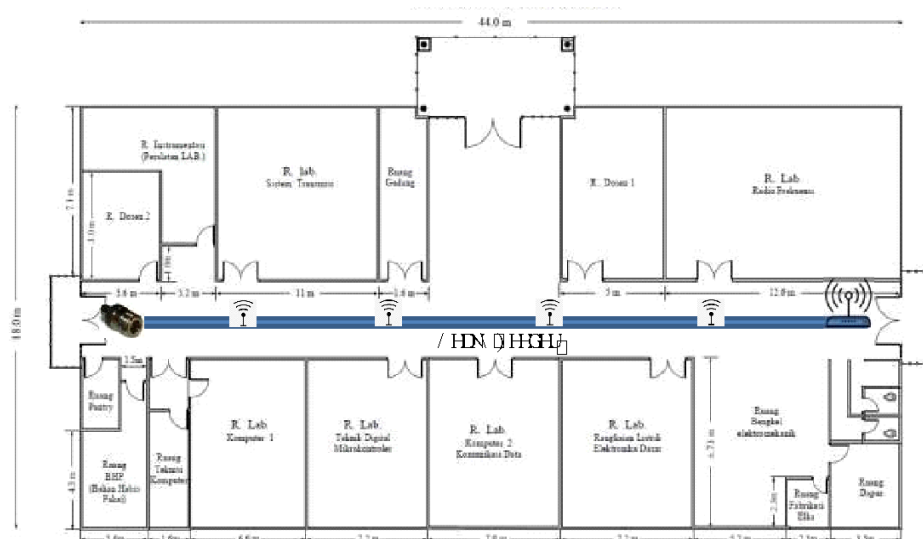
Leaky Feeder Installation Plan in Building Hallways
